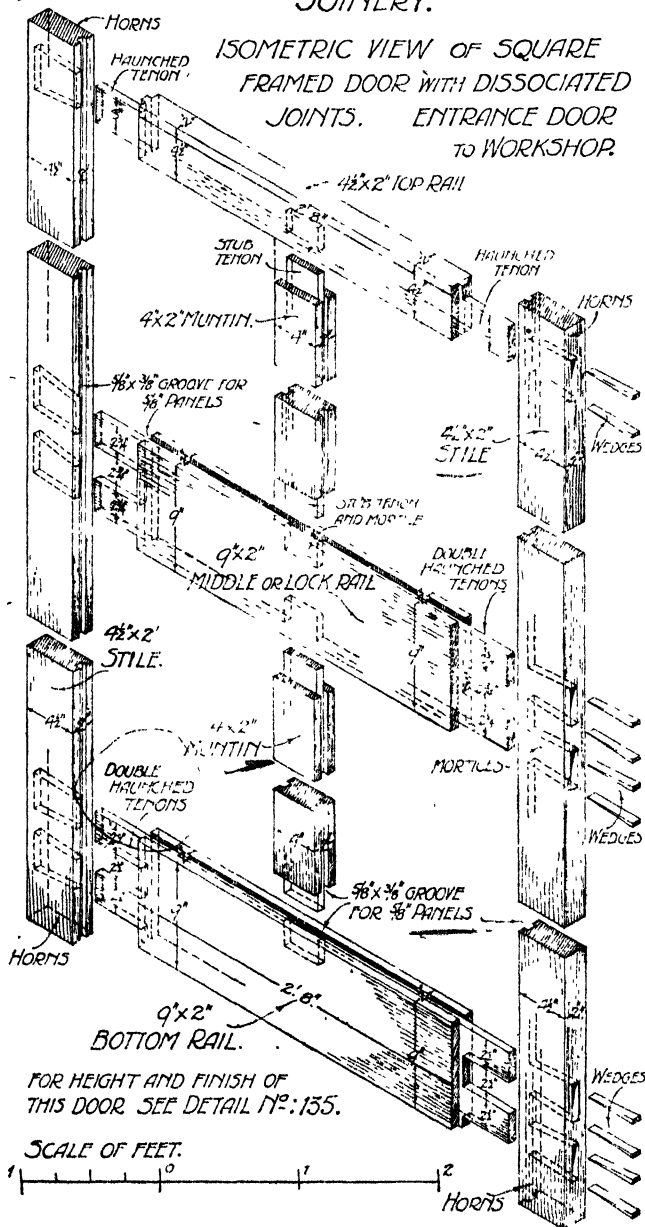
shows the "principle of framing" applied to a four-panelled door. The members constituting the framing are: "stiles" (outside verticals), "rails" (top, lock and bottom rails) connecting the stiles, and "muntins" (intermediate verticals) framed between the rails. All the joints are clearly shown in isometric detail and embody similar "stile and rail" joints to those employed in framed and ledged doors (except that they are centrally placed) and with short tenons, 2" to 3" long, at the "muntin and rail" joints.
